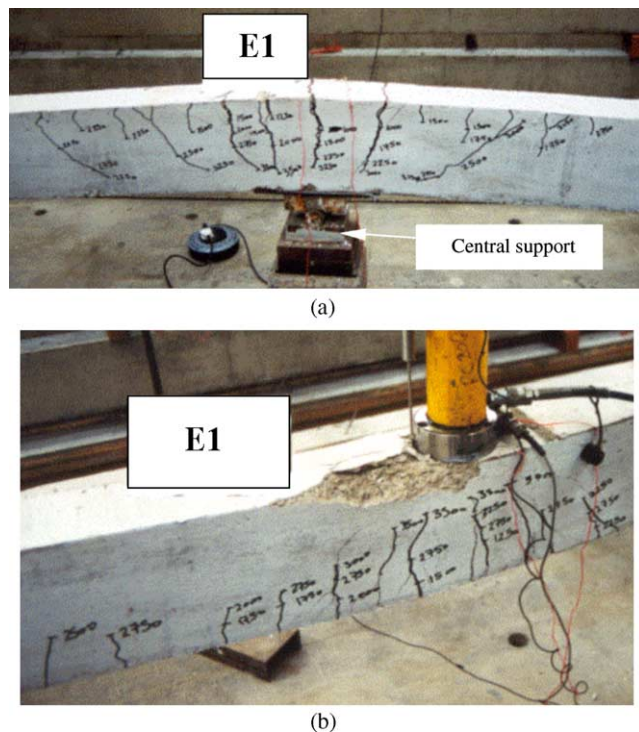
Conventional ductile failure of control beam E1. (a) Over central support; (b) at mid-span.
